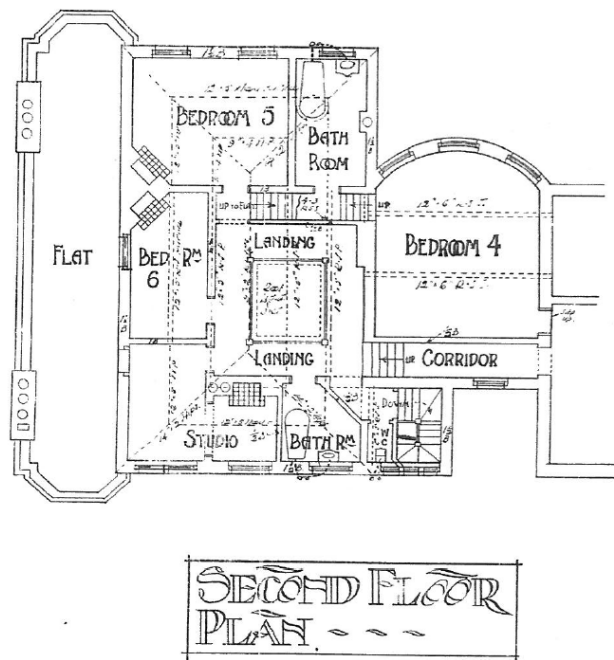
Second Floor Drainage Plan, no.9 Arkwright Road, Hampstead, London, 1907* (London Borough of Camden Local Studies and Archives Centre)
